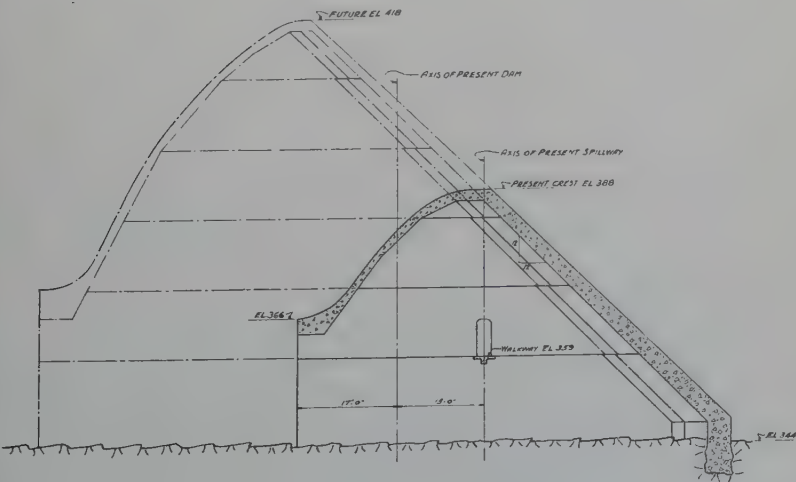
TYPICAL SECTION THROUGH SPILLWAY
